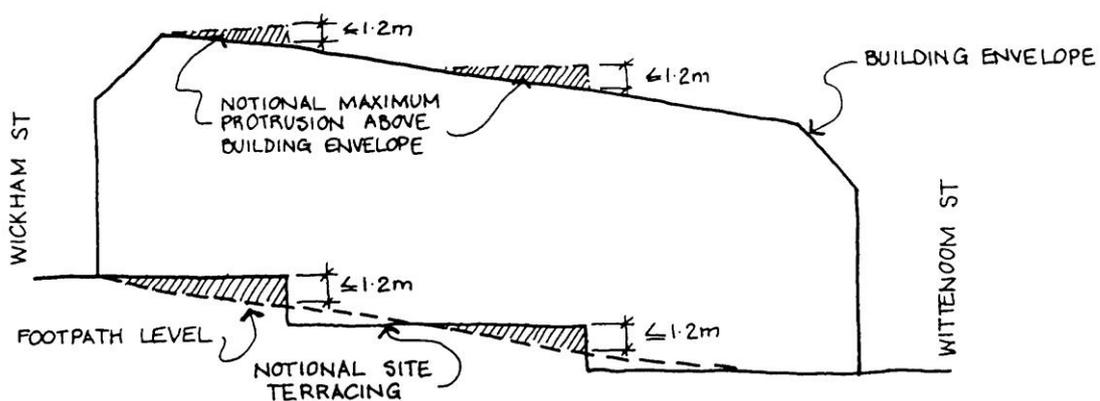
Maximum retaining height and protrusion beyond building envelope
